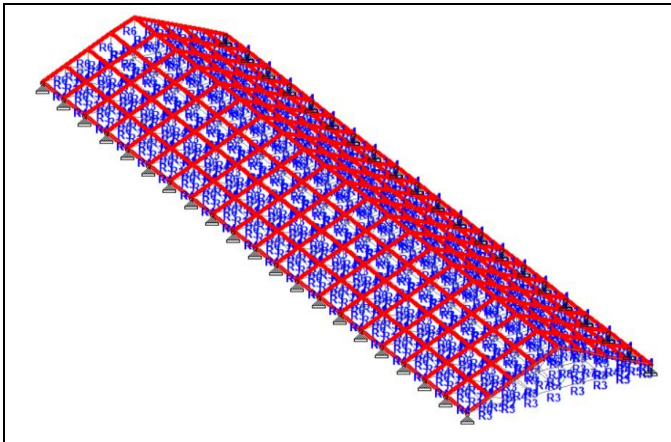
Aluminum Plate Thickness of 0.008mm Provided to the Steel Roof Truss for Angle Section.
